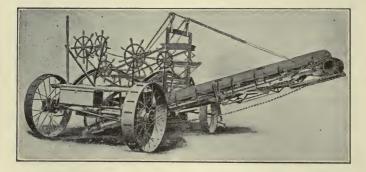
Elevating grader, very cheaply elevates earth out of ditches or upon long grades.
